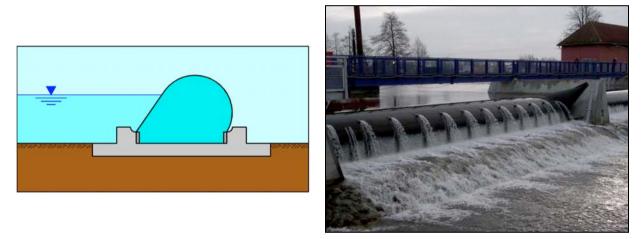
Construction principle of a permanent installed tube system (left) and an example of a water-filled weir in Marklendorf at the river Aller, Germany⁷ (right)
